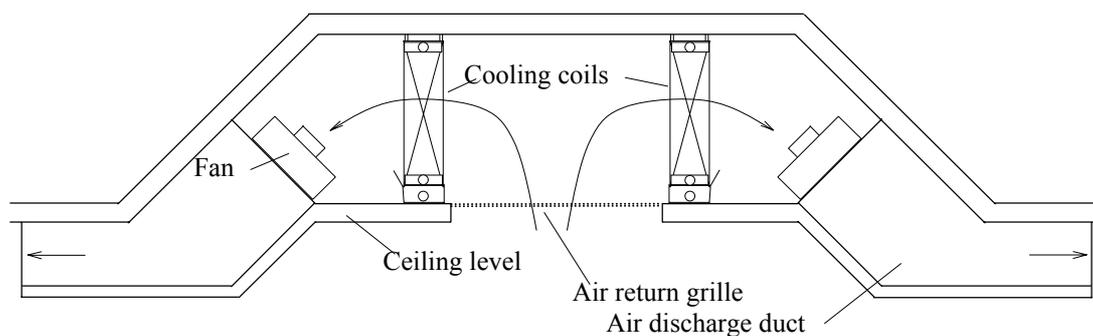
Cross sectional view of penthouse evaporator design in end elevation.
